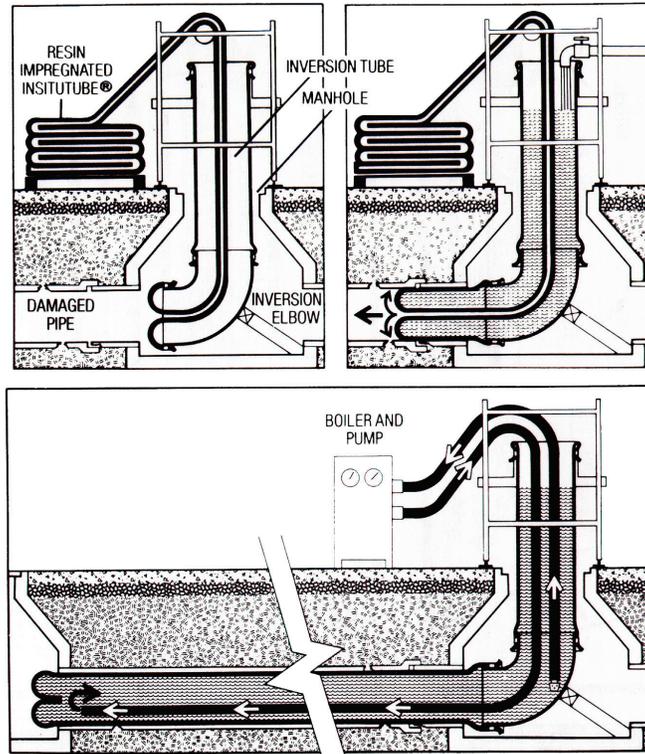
Drawings. Insituform’s Cured-in-place Lining Inversion Installation Method.⁽⁸⁾
